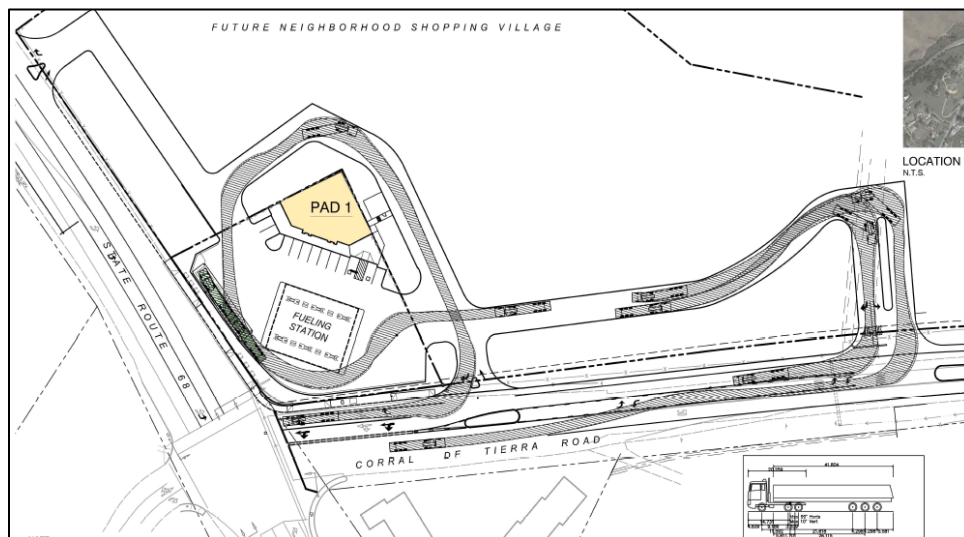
Access plan illustrating no on-site driveways, and utilization of three driveways approved under Board of Supervisors Resolution No. 12-040.
